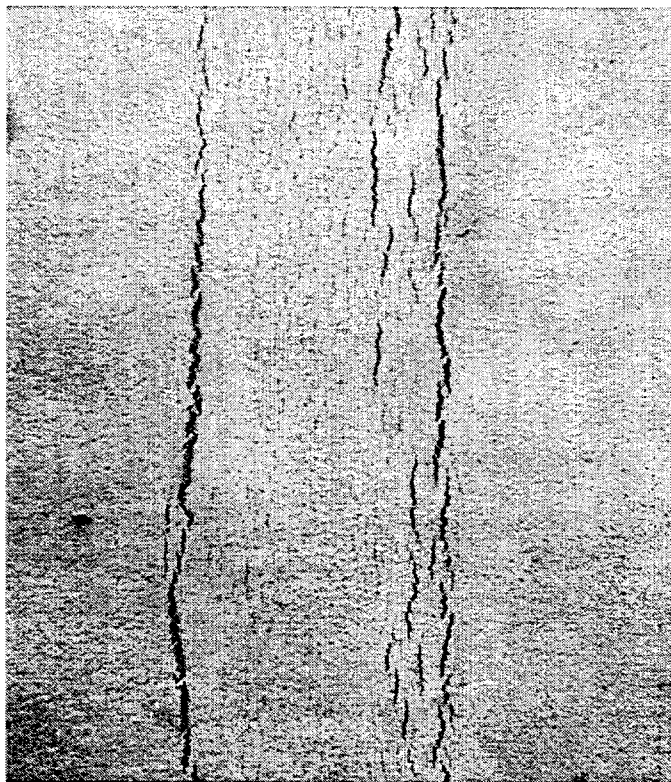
Closeup of exterior view of local deformation (causing cracks in paint) at the vertical weld in LCS at 340°.
